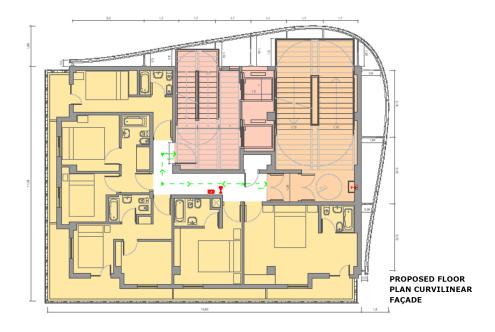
Modified floor arrangement with two new fire escapes. Curved envelope.
